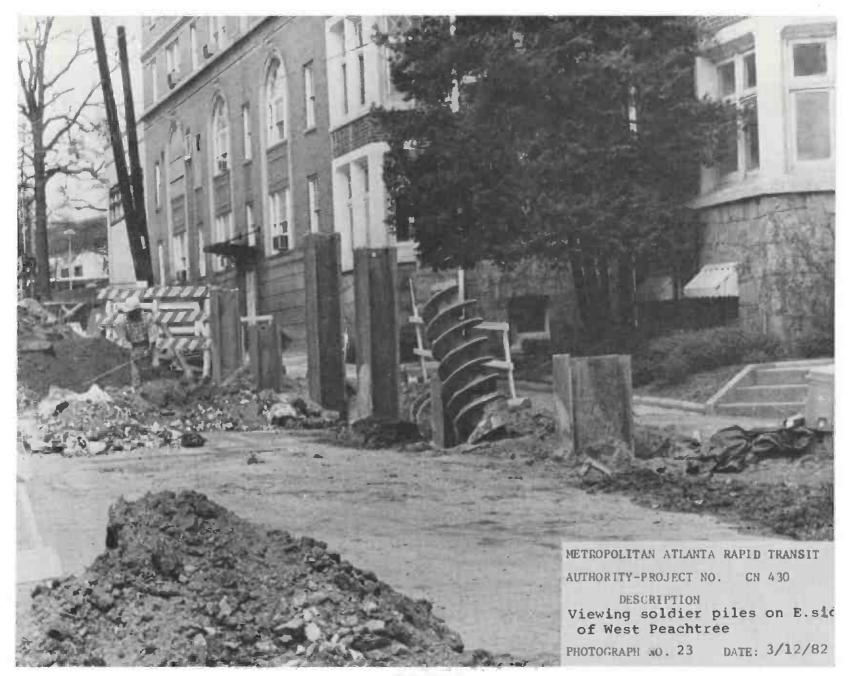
SOLDIER PILES AROUND FUTURE STATION PERIMETER
